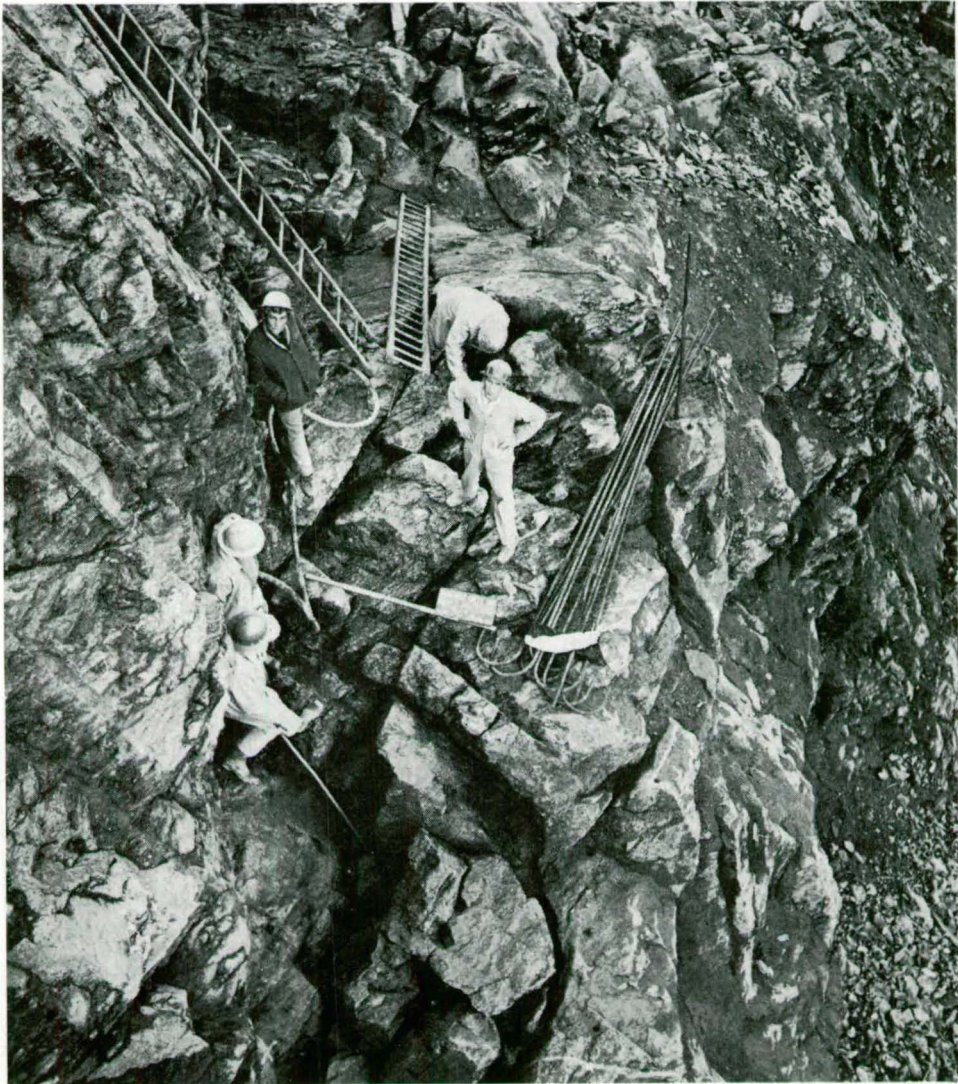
Floor of right abutment excavation, with numerous gaping joints open up to 30 cm.
